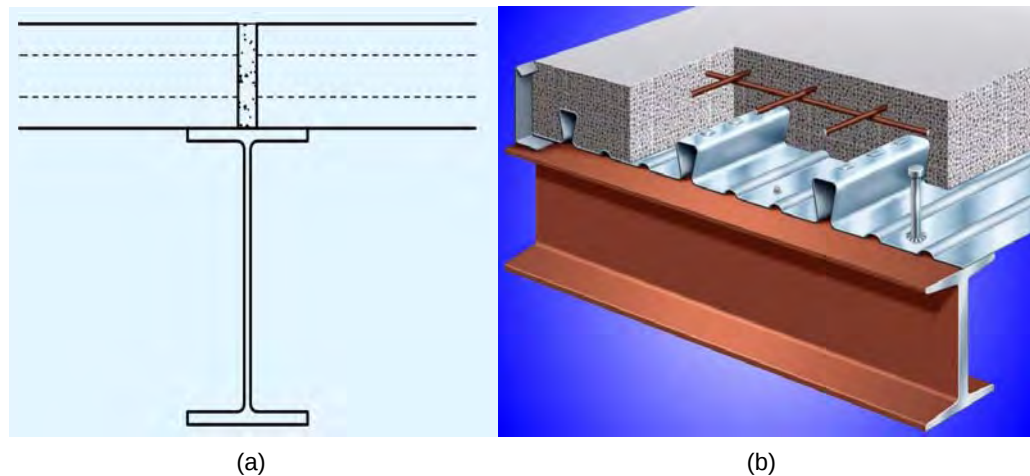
(a) Precast concrete floor on down stand beam; (b) composite floors with steel decking
